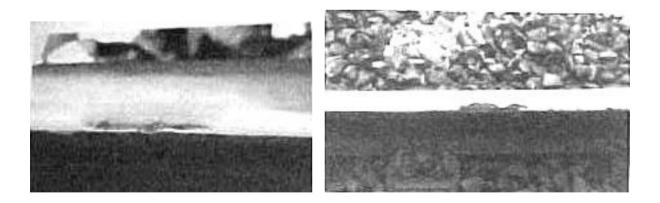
1222 OR 2222 - HEAD, SURFACE, BREAKING OUT GAUGE CORNER (SHELLING)
